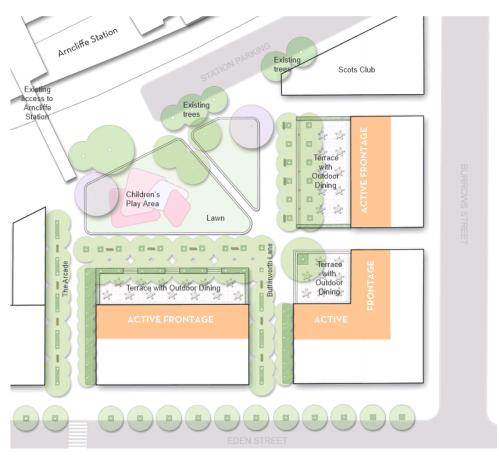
Indicative Concept Plan Wooroona Reserve
